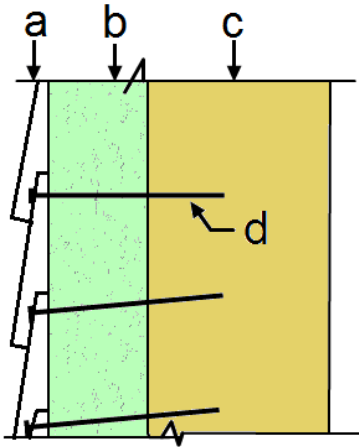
Exterior Wall Covering Assembly with Cladding Installed Directly Over GreenGuard® Insulation Board
